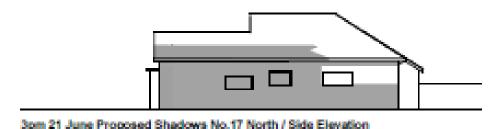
Proposed elevation shadow diagram- 3pm June 21
